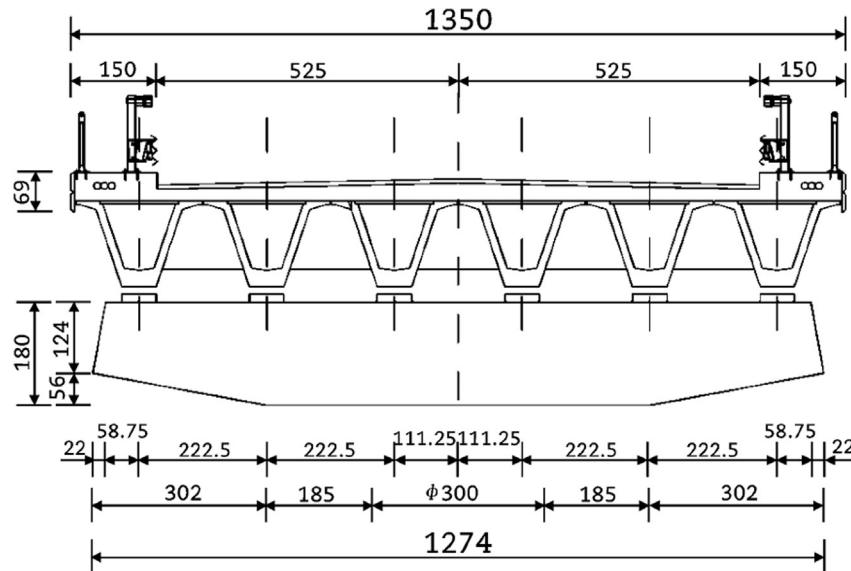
Typical cross section of Isola della Scala Bridge (cm).
